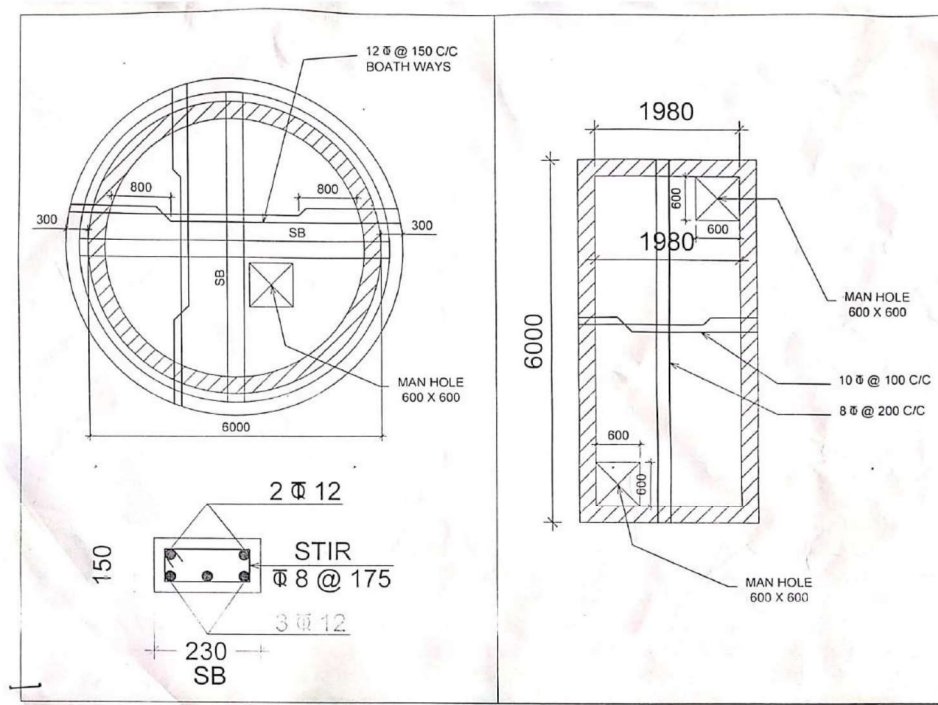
C/S details of Soak Pit/ Septic Tank constructed for Wastewater Management
